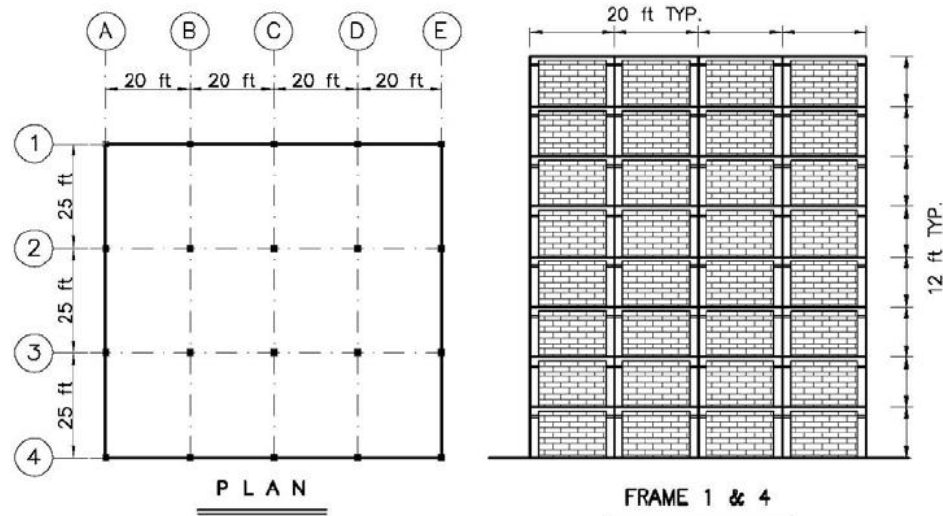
Eight-story office building example (1 in. = 25.4 mm).
